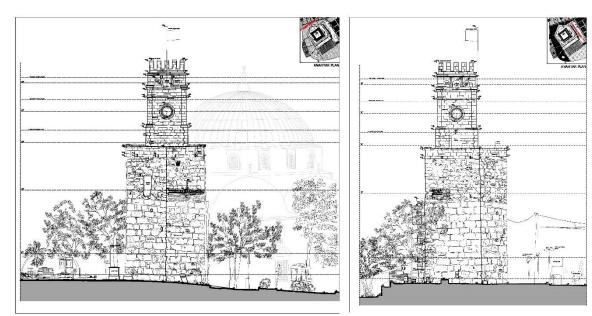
Northwest and Northeast Facades of the Clock Tower (From left to right).
